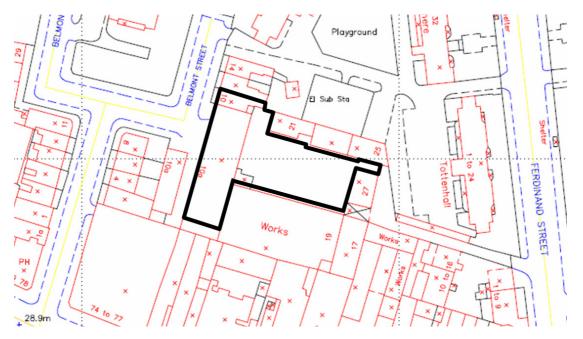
Existing Site Layout and Application Black Line Boundary (Not to Scale) Source: John Pardey Architects
